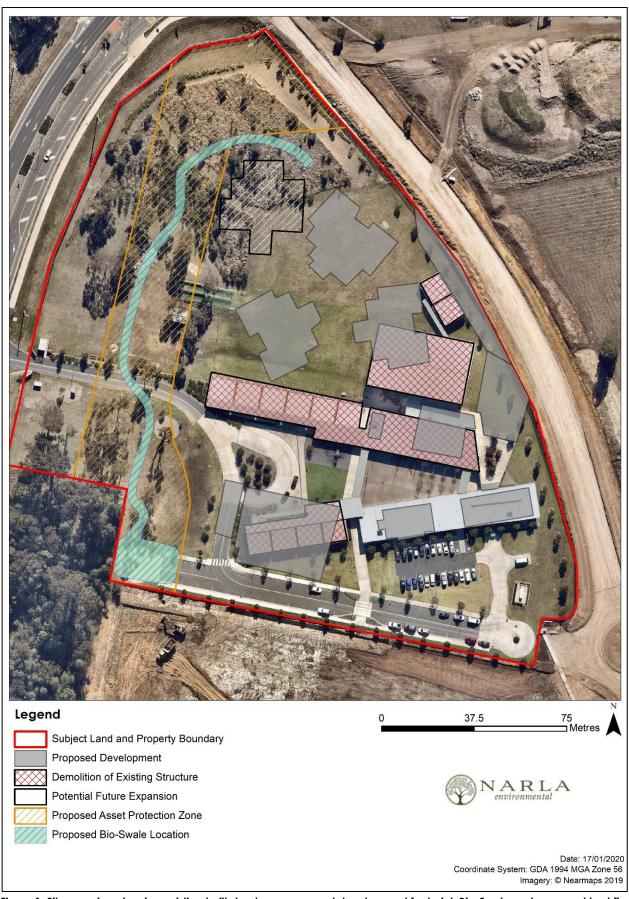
Site overview showing existing built structures, proposed development footprint, Bio-Swale and proposed bushfire APZ.
